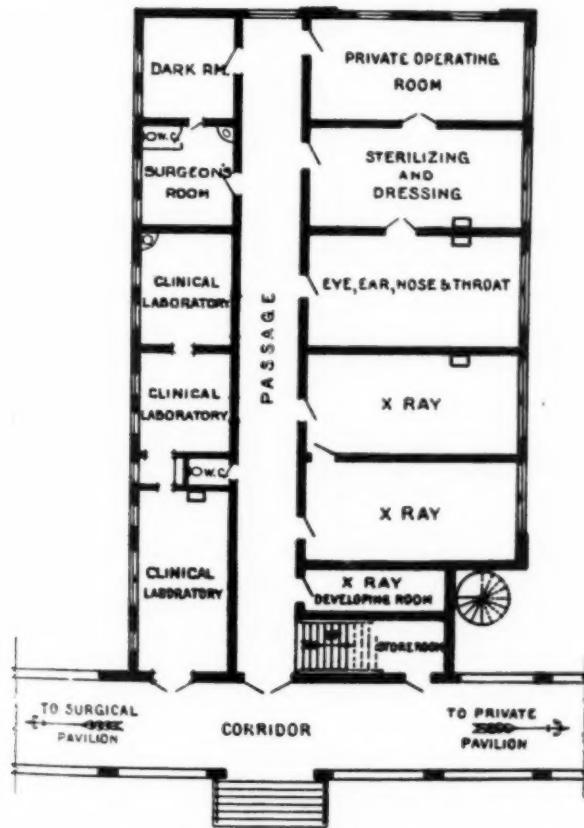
Physical therapy, clinical laboratory, and operating pavilion. Ground floor plan.
